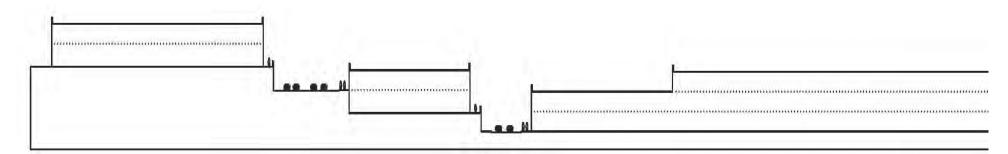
Evans Avenue cross-section near Jennings Street showing Research and Development, retail, and residential buildings.
